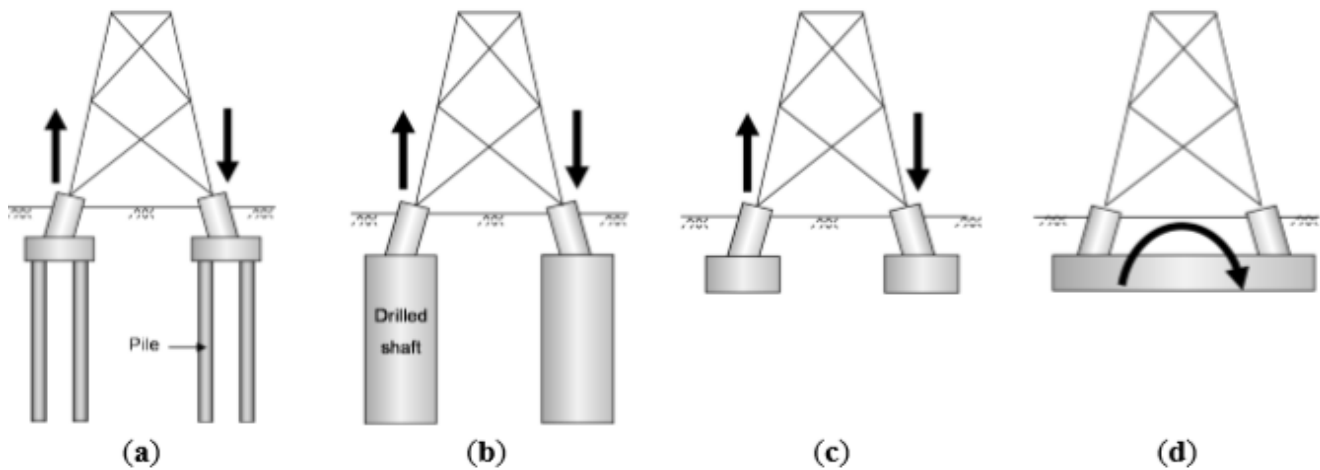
Different types of foundation of transmission tower (a)Pile foundation (b) Pier foundation (c) Inverted T foundation (d) Mat foundation
